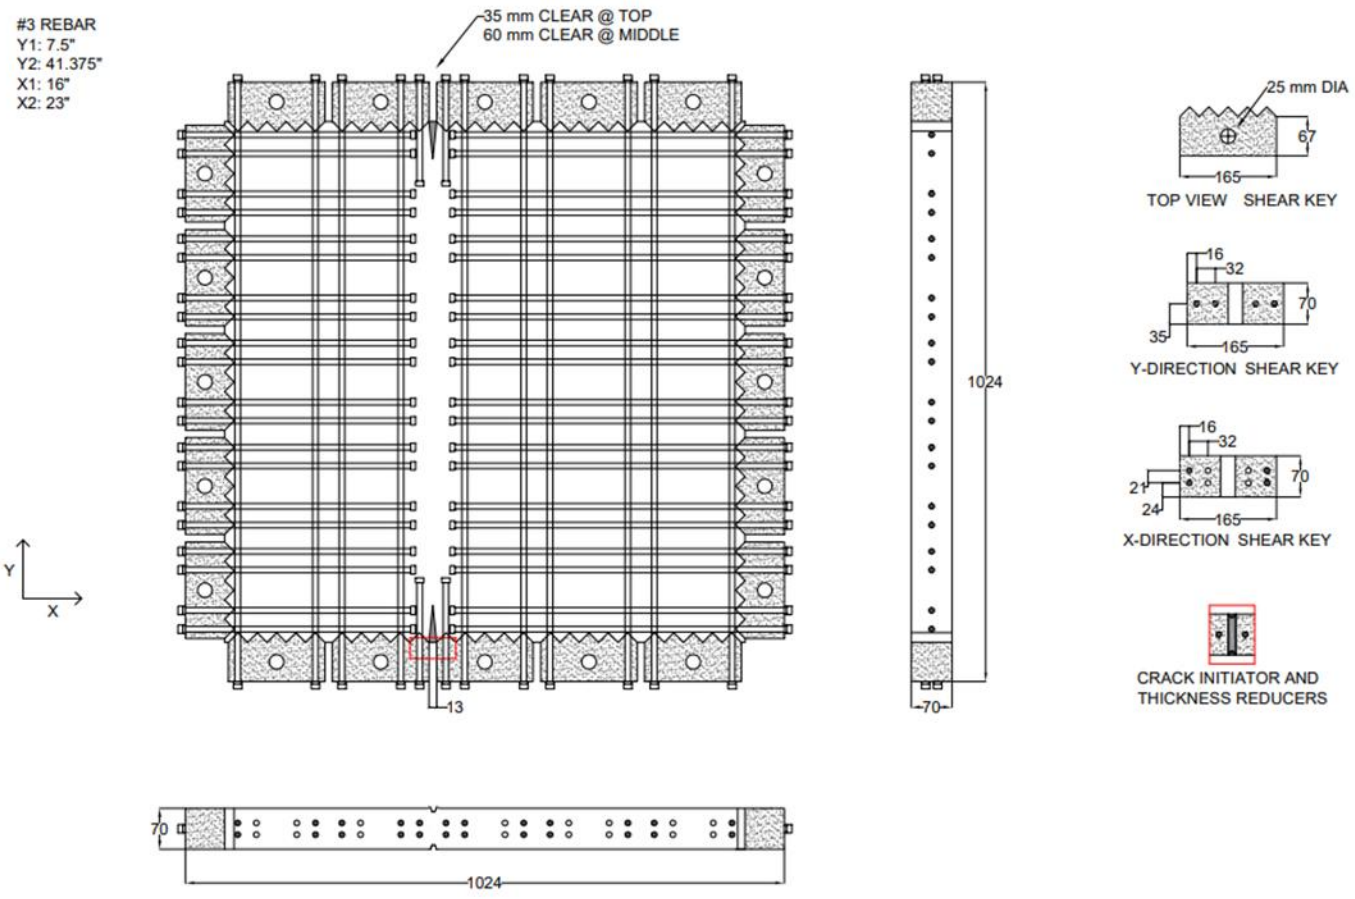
Panel specimen drawing with reinforcement and shear key details
